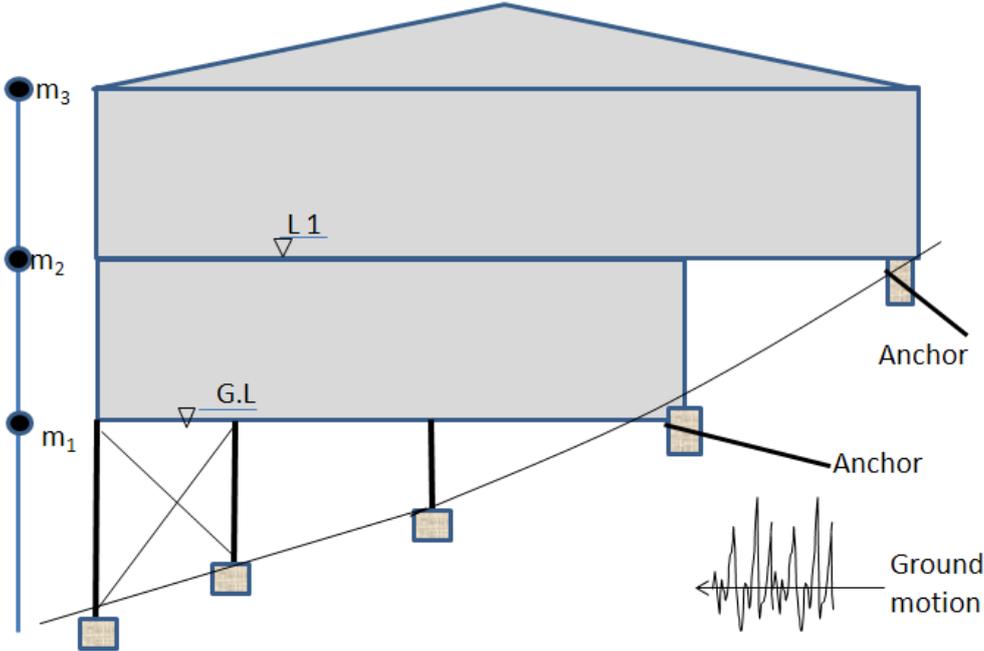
Down-Slope LTF House Anchored at Floor Levels
